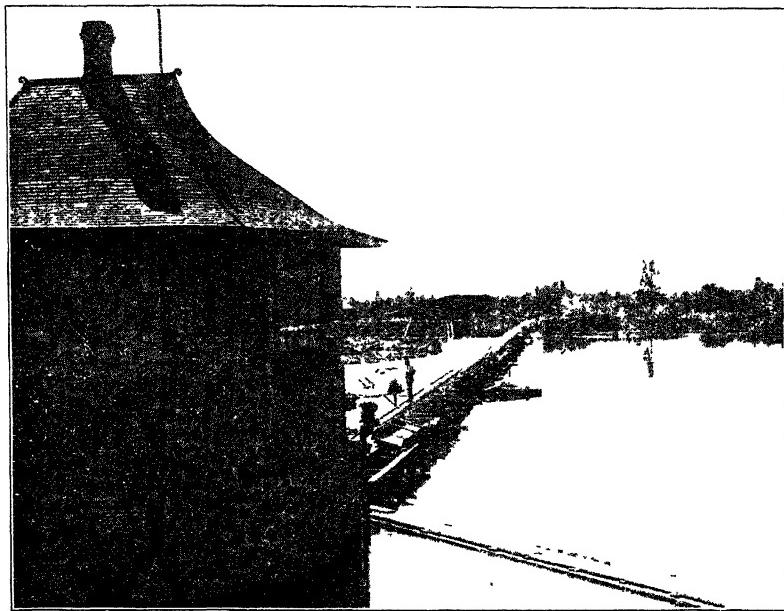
Gate House and Dam, Sunnyside Canal Heading
